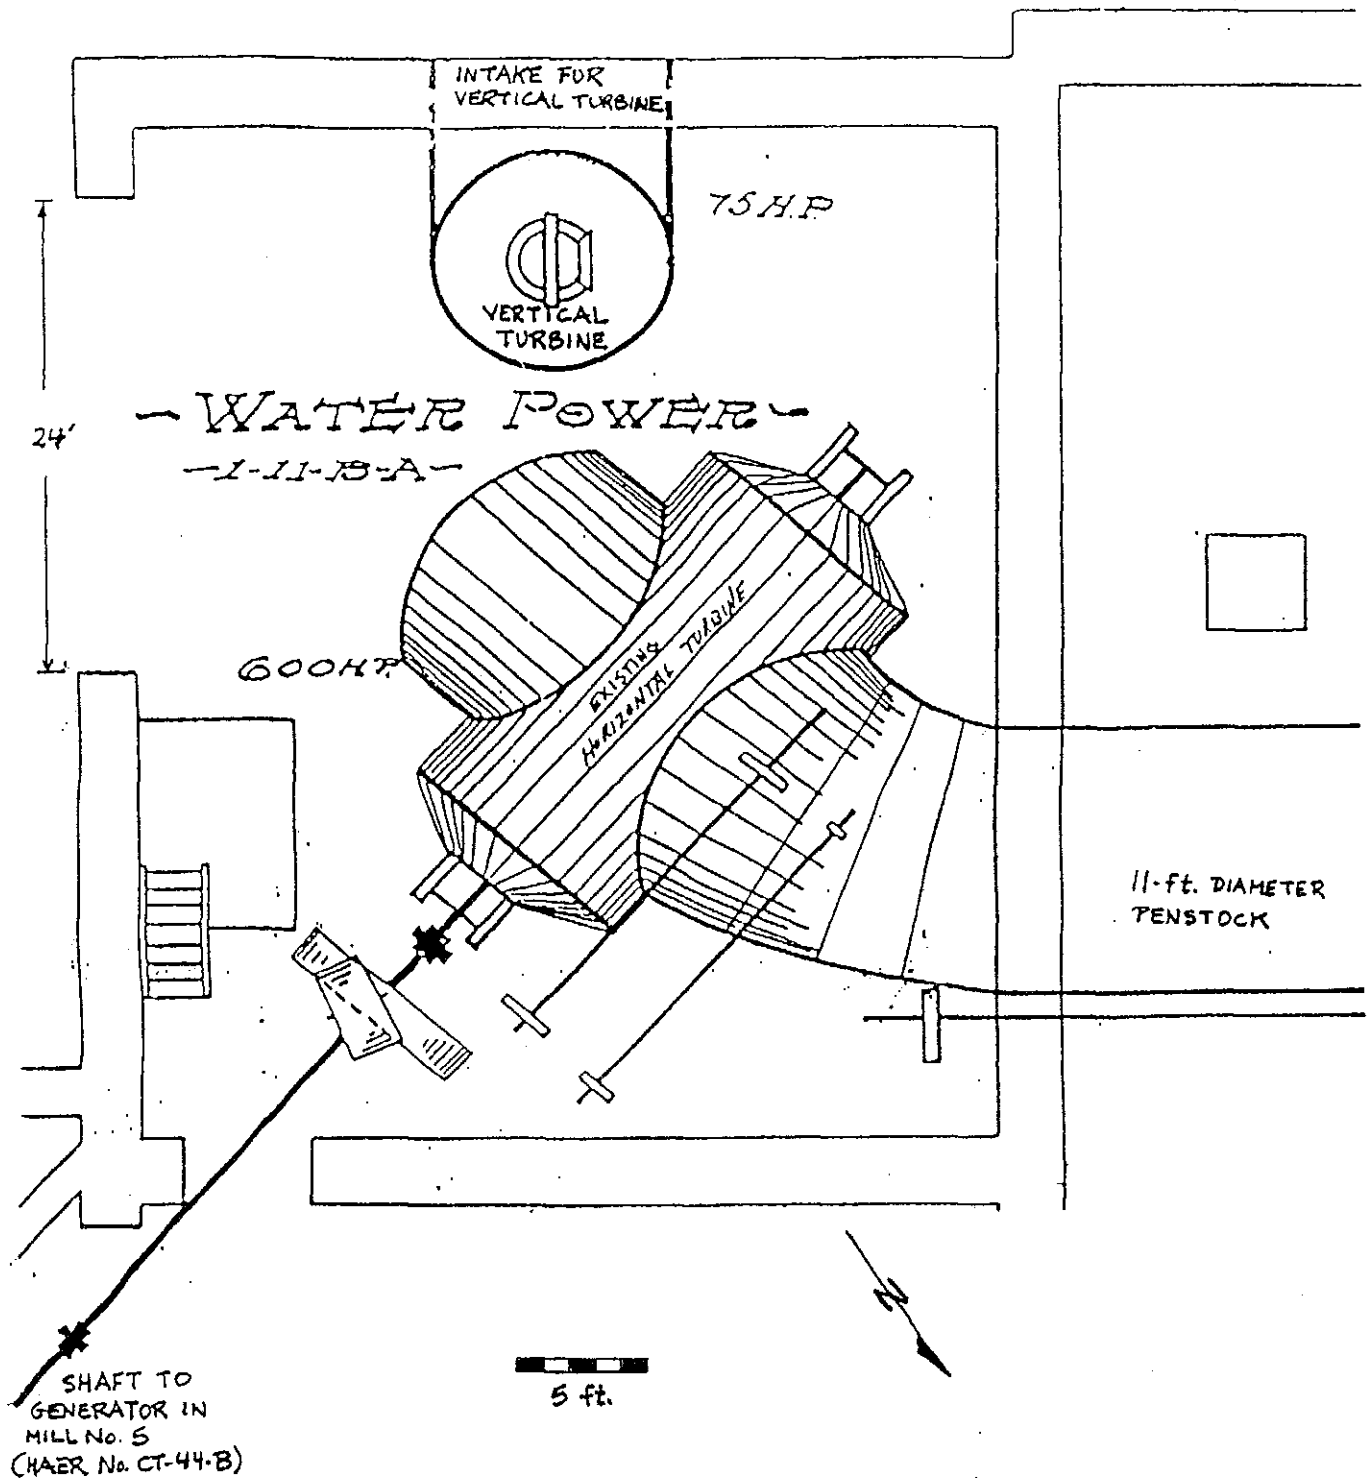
PLAN OF MILL NO. 1 WHEELHOUSE
